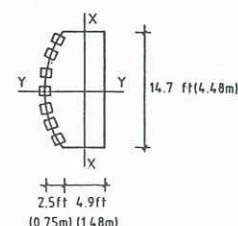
PLAN VIEW OF HEADFRAME SHOWING ARRANGEMENT OF LIGHTS
